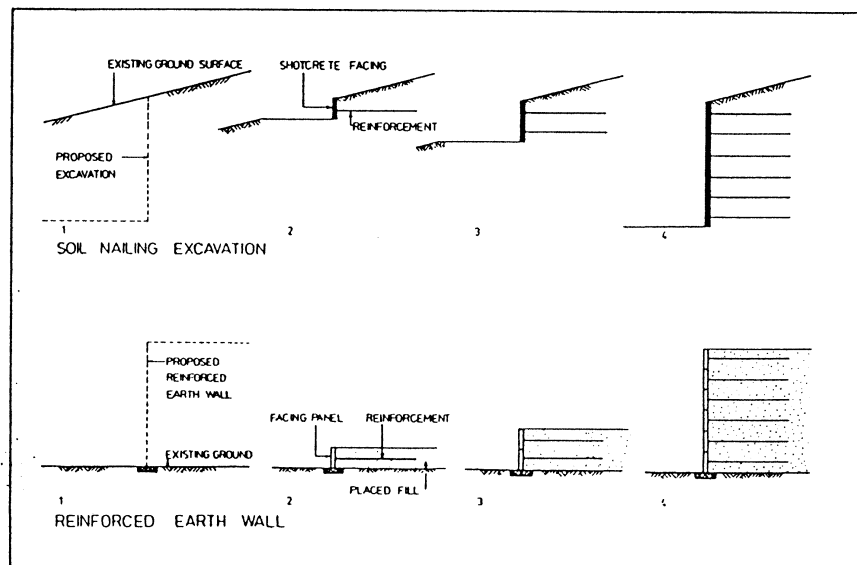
Contrast of the construction sequence (a) "top down" in soil nailing and (b) "bottom up" for reinforced soil
